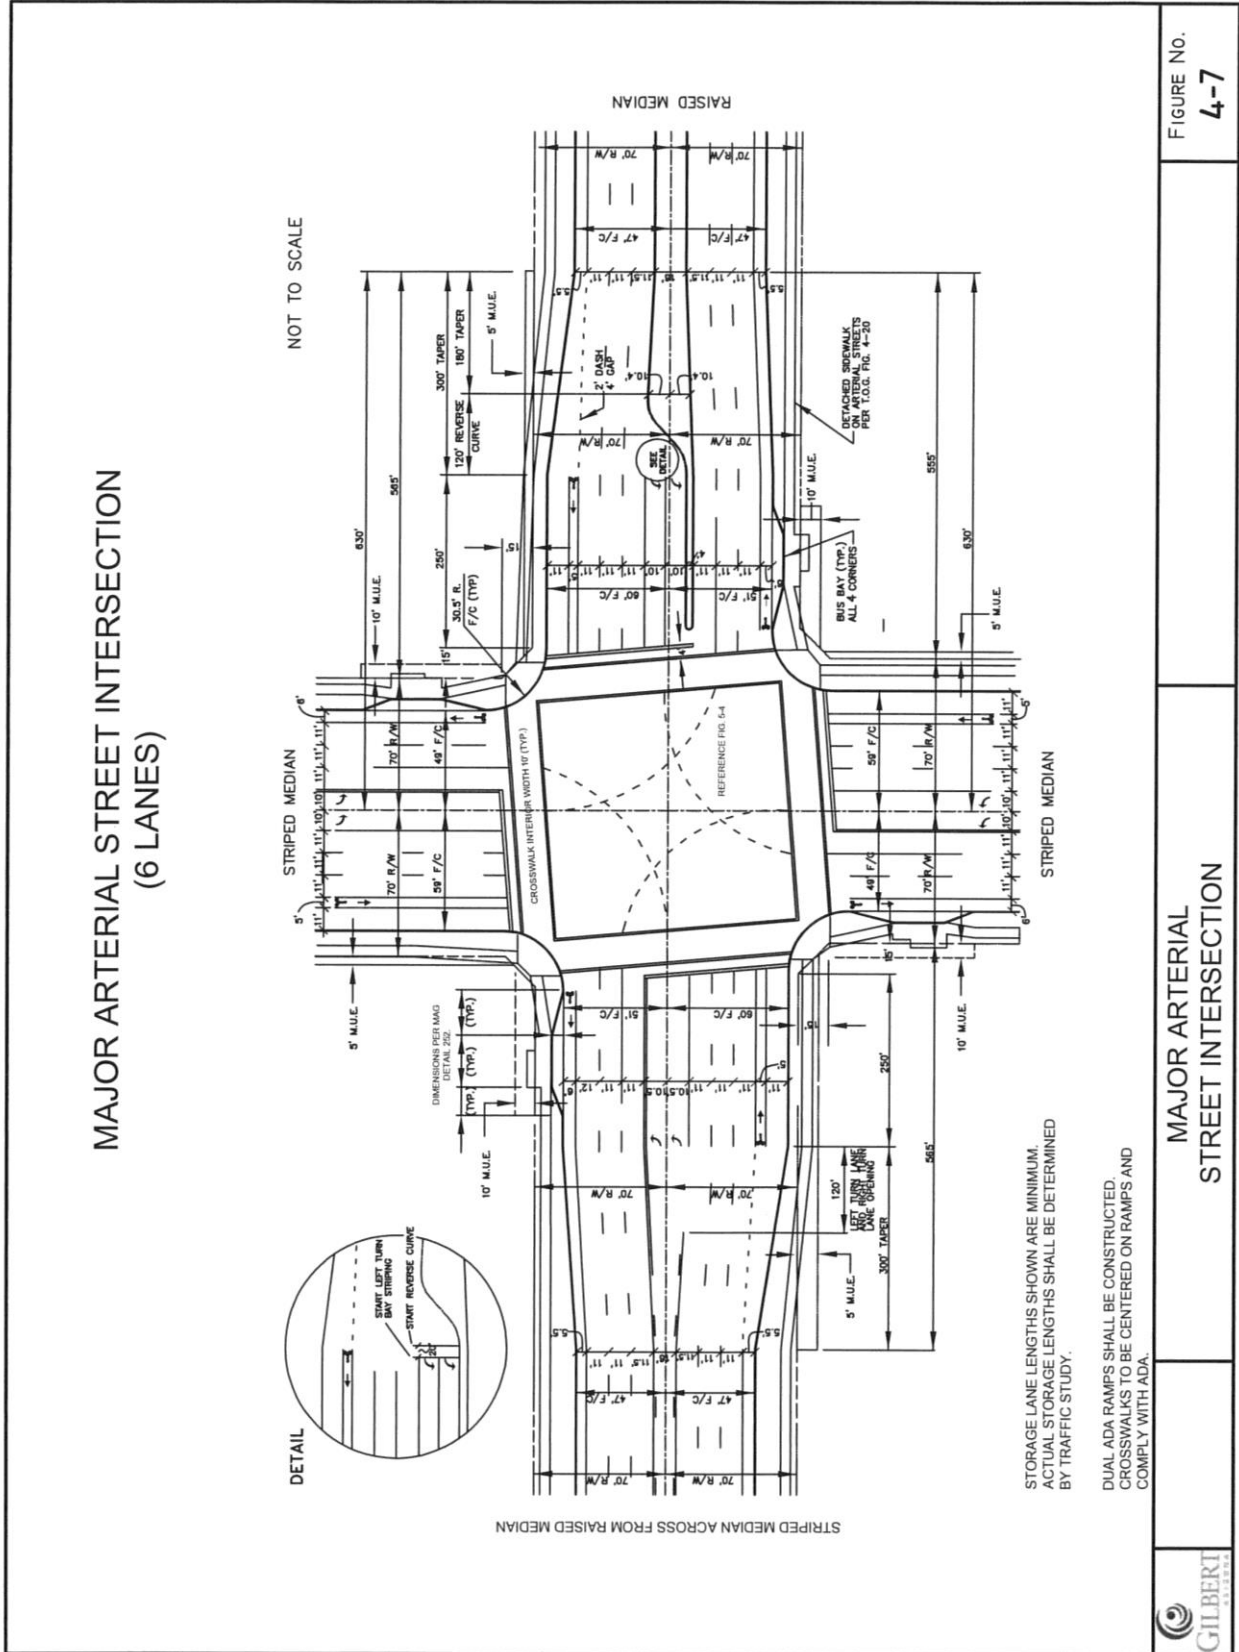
MAJOR ARTERIAL STREET INTERSECTION
